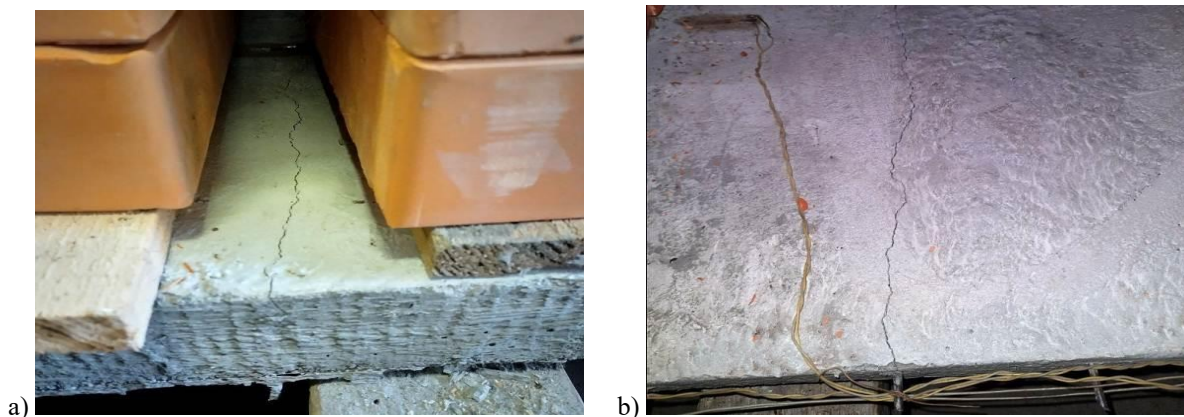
Crack formation at the central support during the failure of the steel–concrete composite slabs
